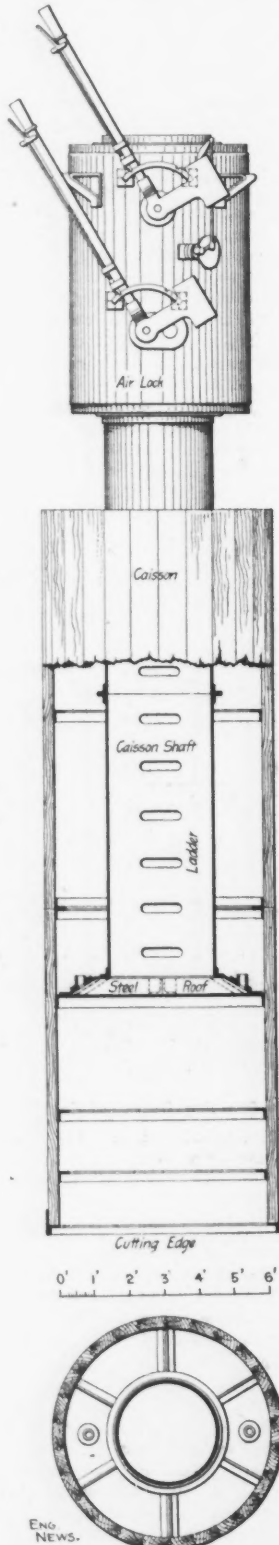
Sectional Elevation of Wooden Cylinder Caisson, Caisson Shaft and Air Lock Combined.
